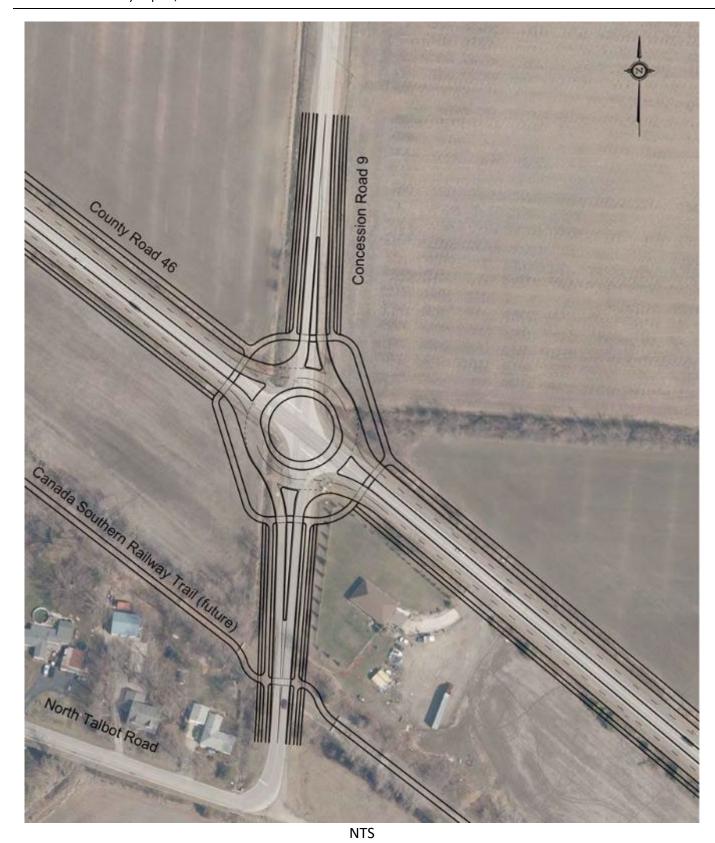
County Road 46 and Concession Road 9 Intersection Alternative C
